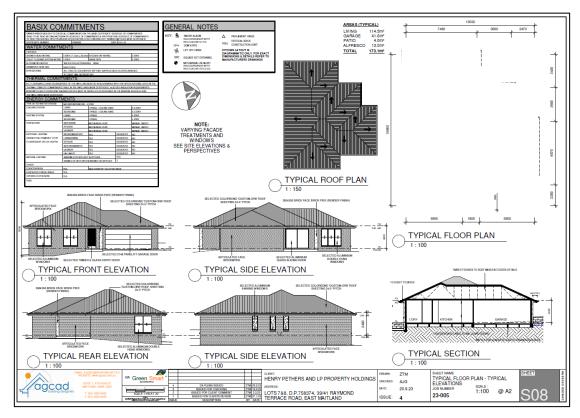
Proposed Basic Floor Plans for each dwelling (source: AGCAD Building Designers)
